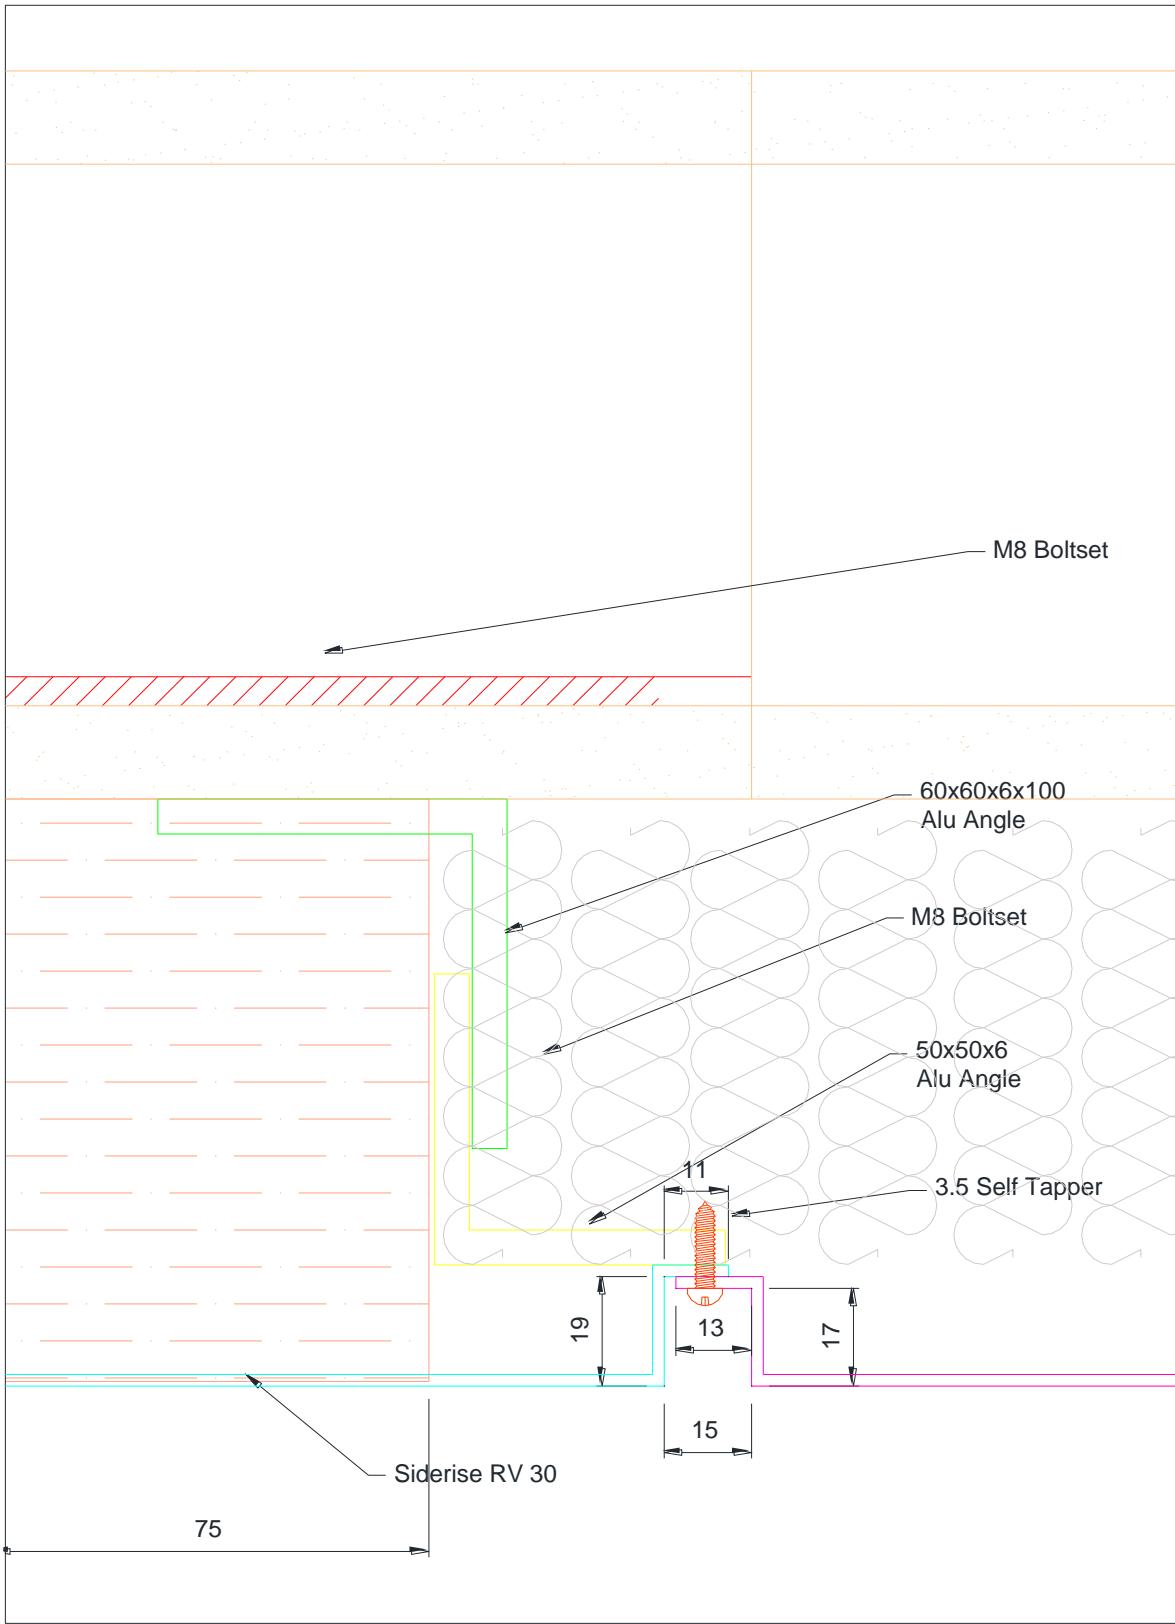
Detail D06 (Bottom edge of the wall) of the specimen.
